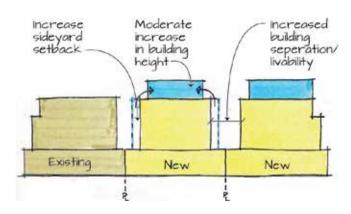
Building Separation for Taller Buildings, northwest part of Cathedral Hill: At a given density, modest increase in height can support greater building separation and more slender buildings, enhancing livability for current and planned future residences
